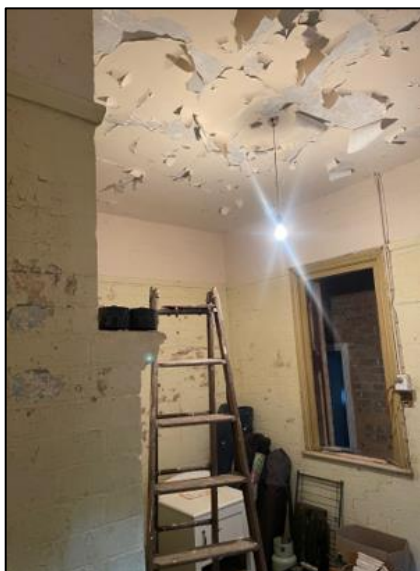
Existing room adjacent to rear laundry (Source: Council's Planning Officer).
